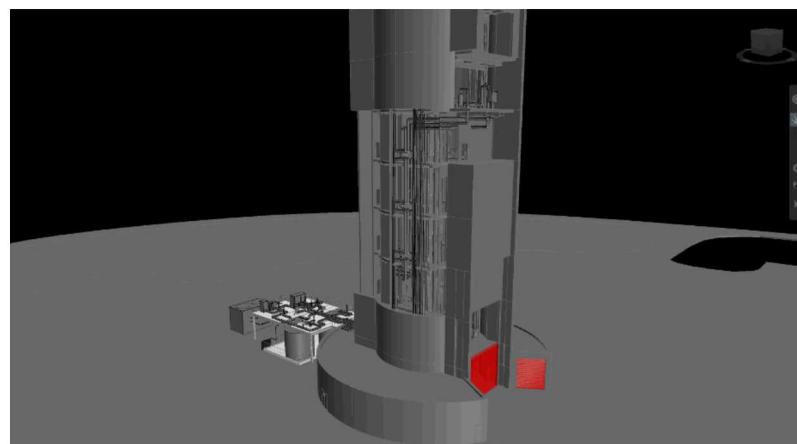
3-D preliminary rendering of the Solar Tower pilot-scale system layout
